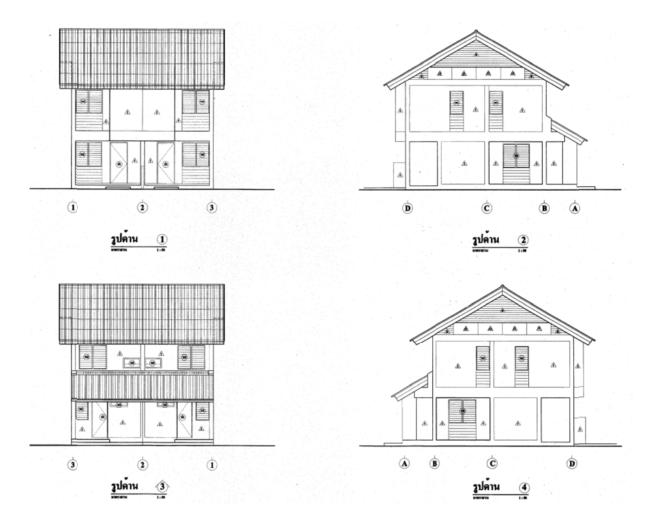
Side plans of the NHA town house for low and medium income earners.
